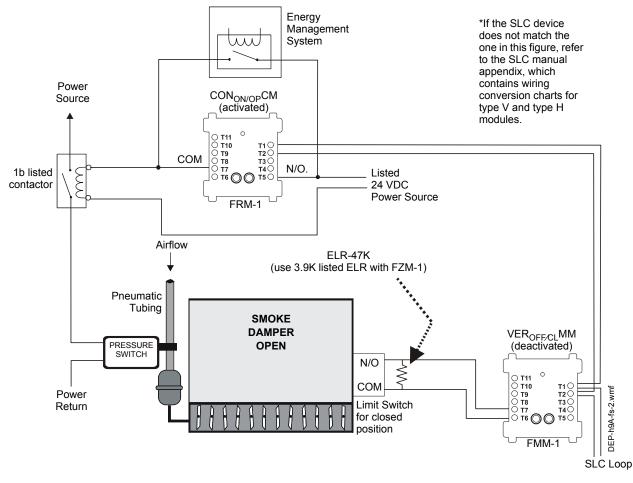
EP Damper Control - HVAC Switch Group Type 9
